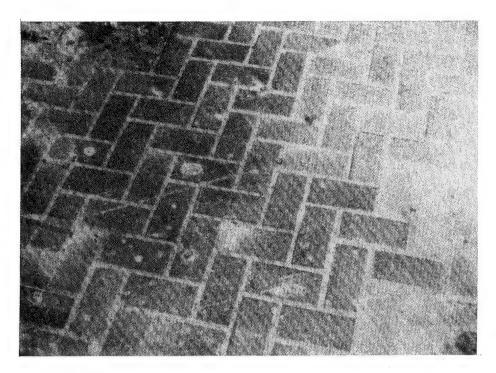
Close-up of concrete block pavement at Aberdeen Proving Ground after 1 year of service (from Anderton 1991a)
